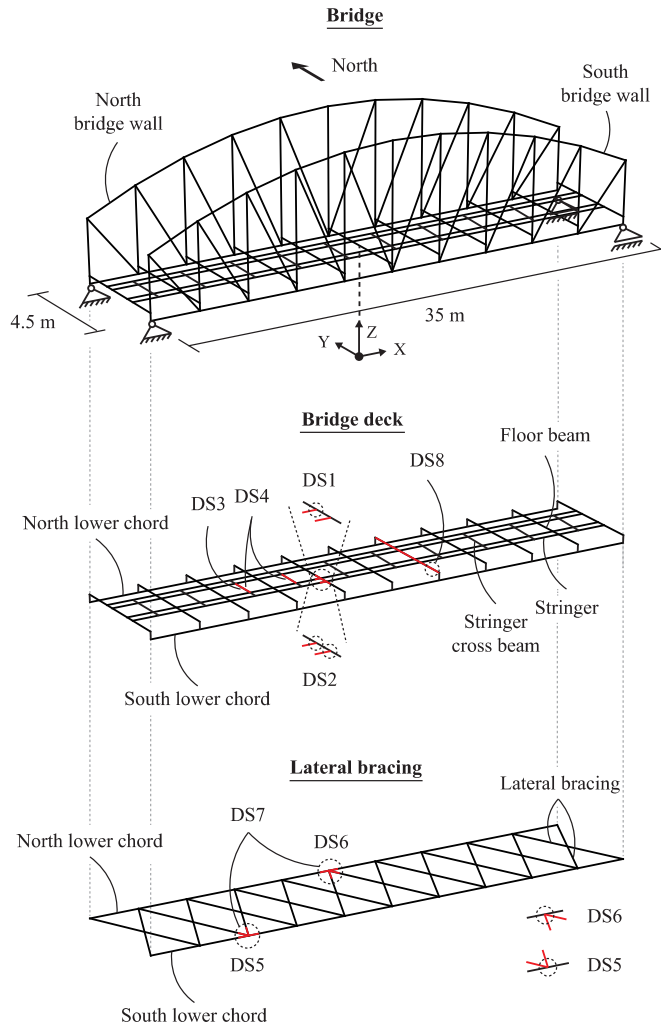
Damage introduced to the bridge deck and lateral bracing.
